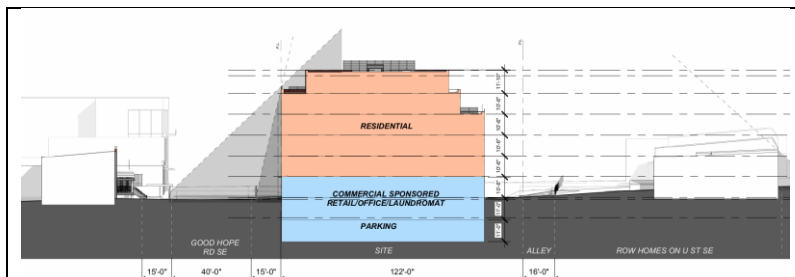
North-south section diagram through Property looking east (Note, Good Hope Road now known as Marion Barry Avenue)
